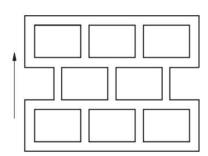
Lightweight concrete masonry units — Geometry 1/1,2
